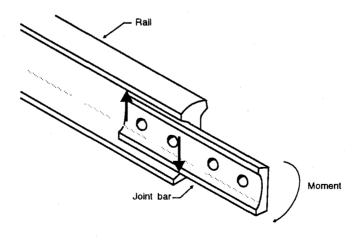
Loads Applied to a Typical Bolted Rail Joint [2]
